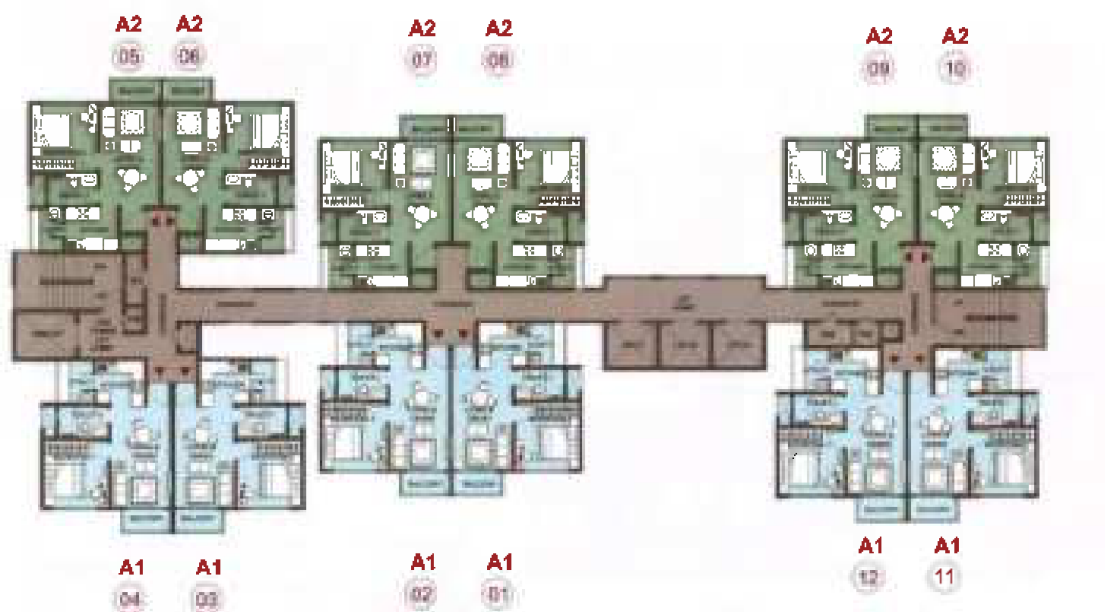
Brochure p. 54: Tower 19 has twelve homes on a regular floor, sharing the central corridor and lift core. A1 and A2 are compact one-bedroom plans, not the larger low-floor one-bedroom homes in other towers.
